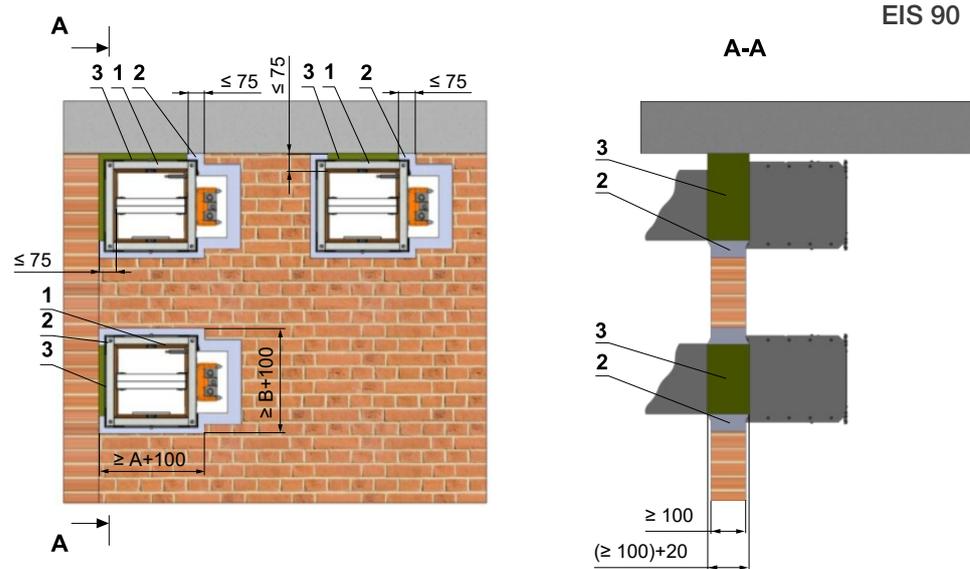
Solid wall construction - Installation next to wall/ceiling - mortar or gypsum and mineral wool
